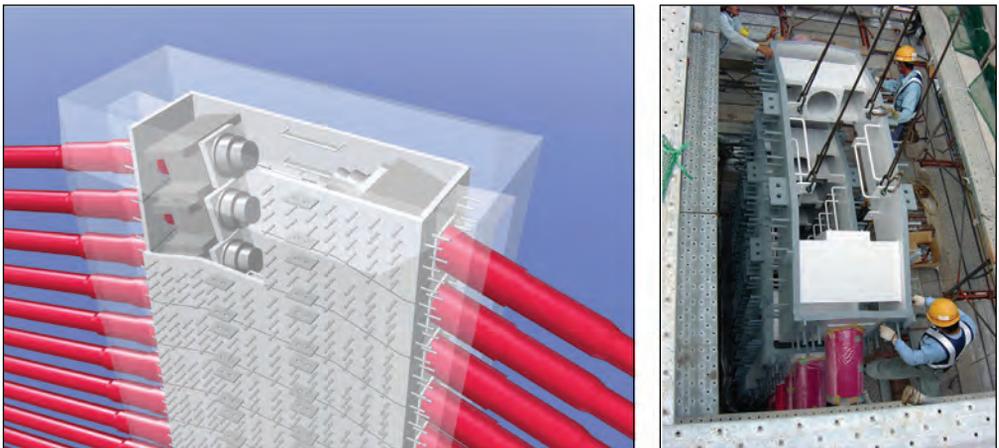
Composite pylon structure for anchor stay cables (Shin-Meisei Bridge)
